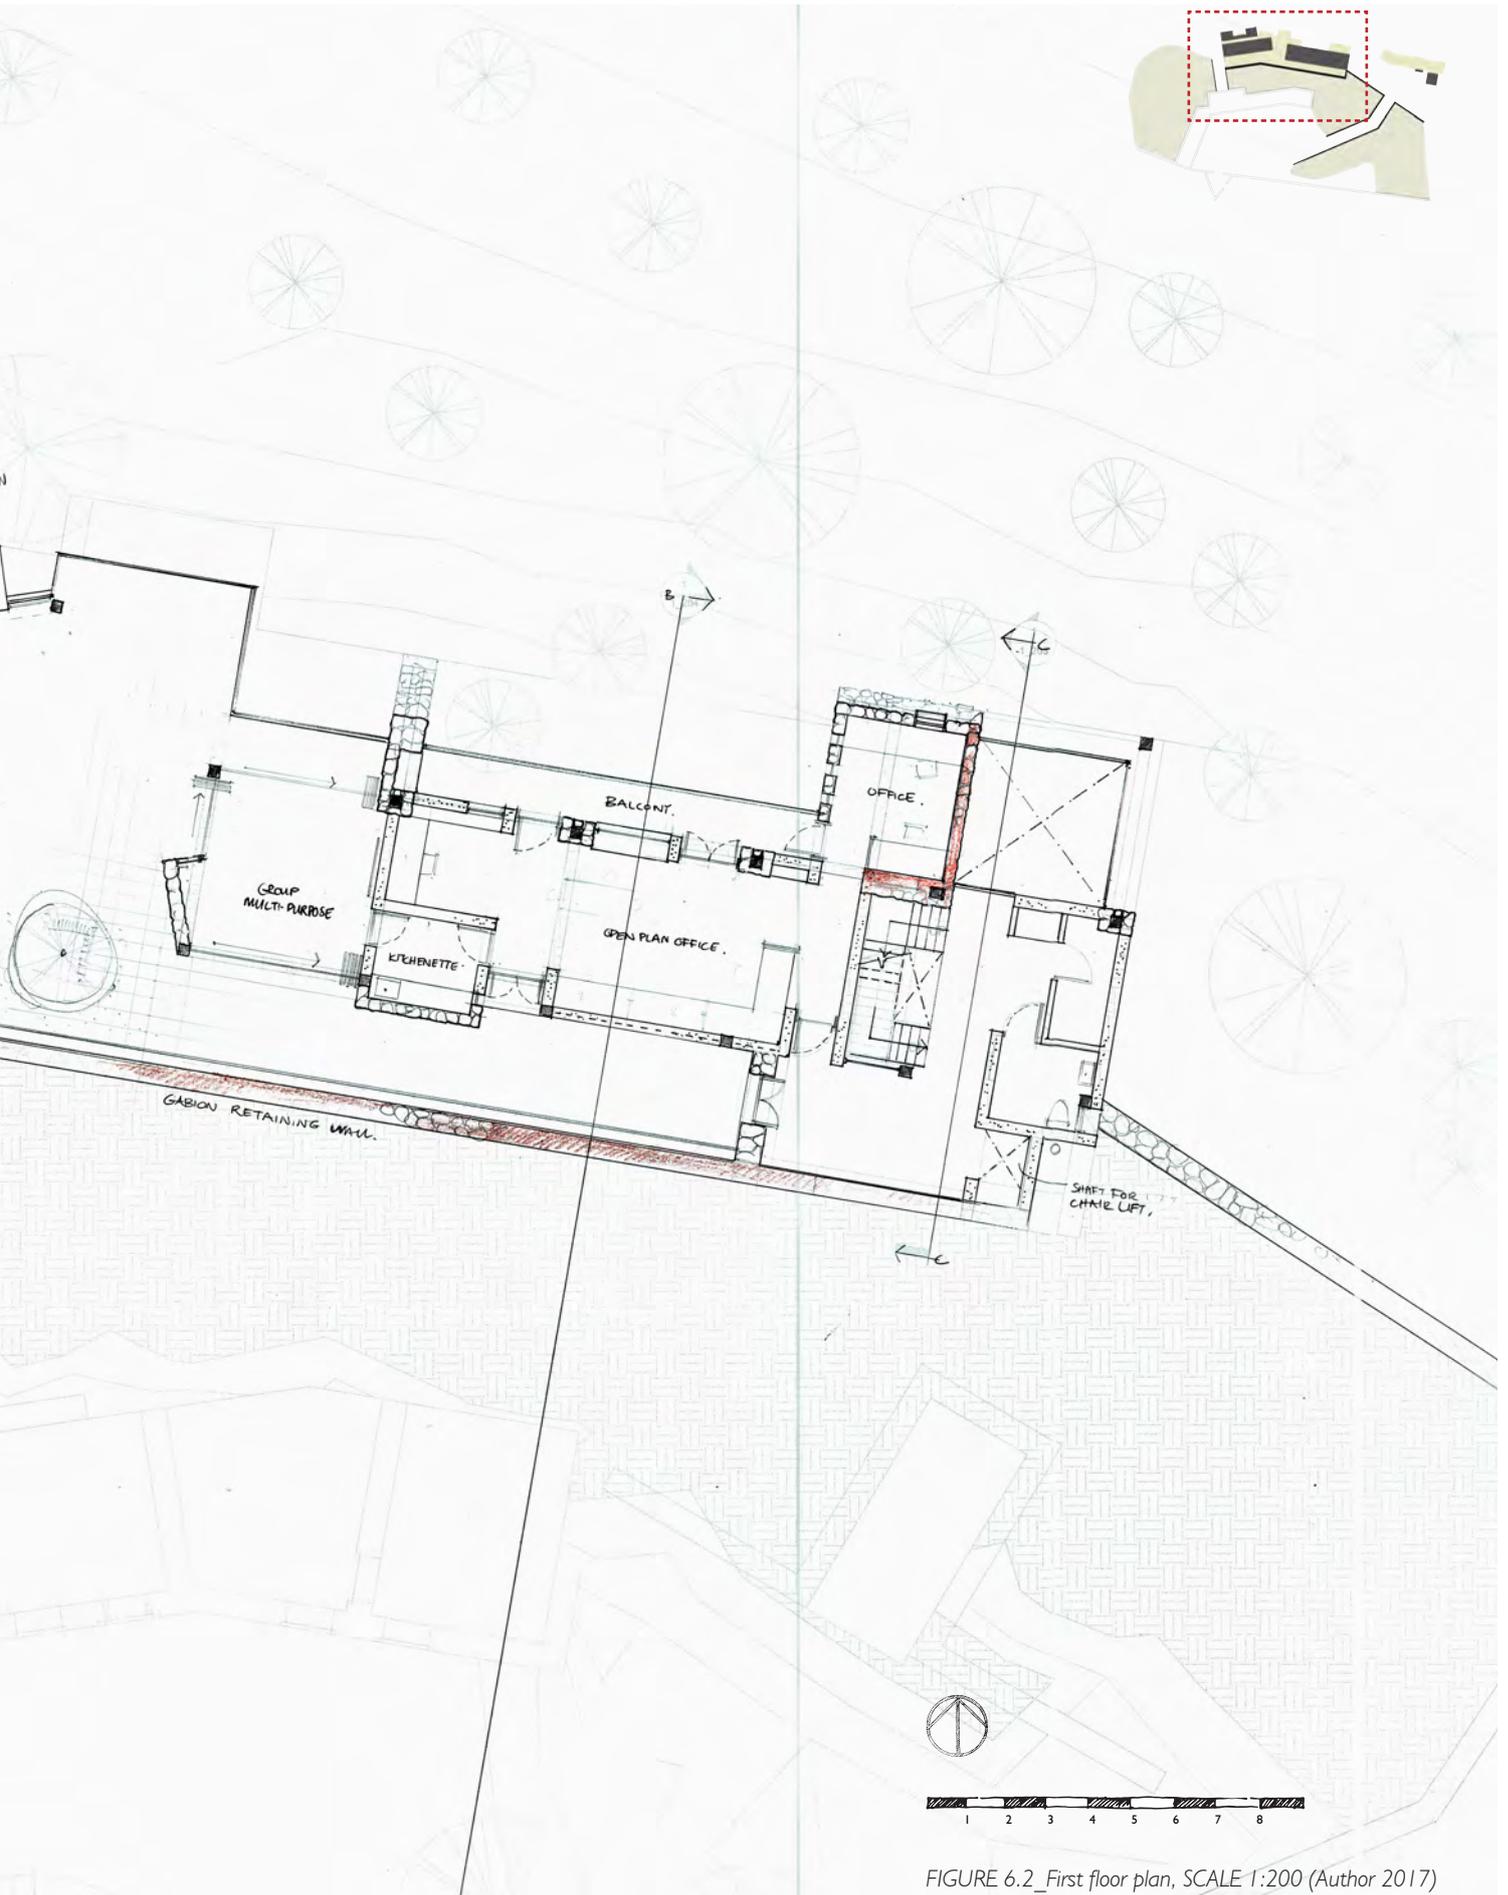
First floor plan, SCALE 1:200 (Author 2017)
